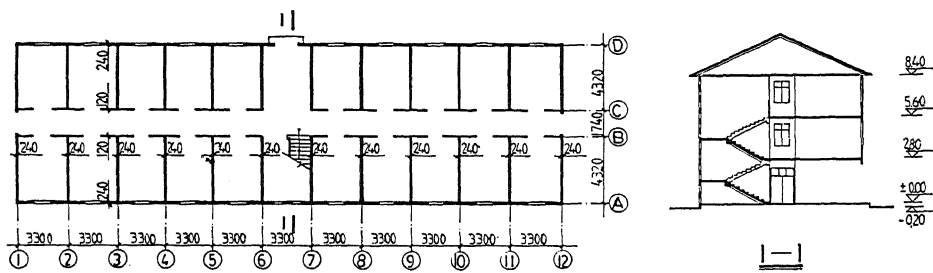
Plan and elevation of office building of Zigong Third Radio Plant
